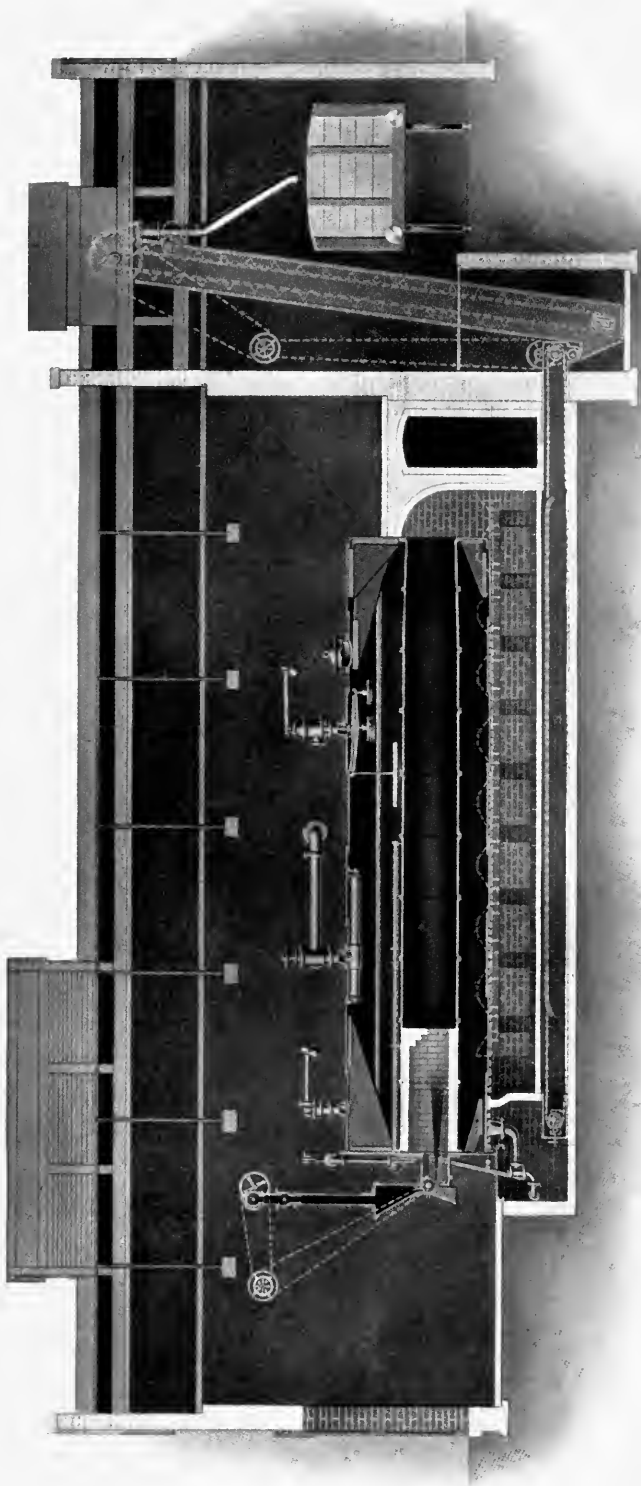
PLATE III.—SECTIONAL VIEW OF COAL DUST FIRED BOILER.
